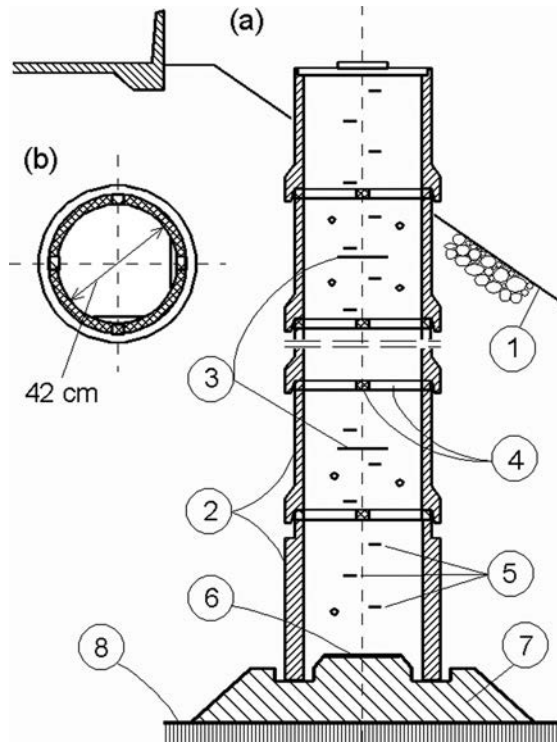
Swedish well (Sherard, 1963). (a) Longitudinal section; (b) cross-section. (1) Embankment slope; (2) reinforced concrete pipes; (3) measuring bars; (4) wood blocks; (5) ladder rungs; (6) brass plate; (7) concrete; (8) rock.
